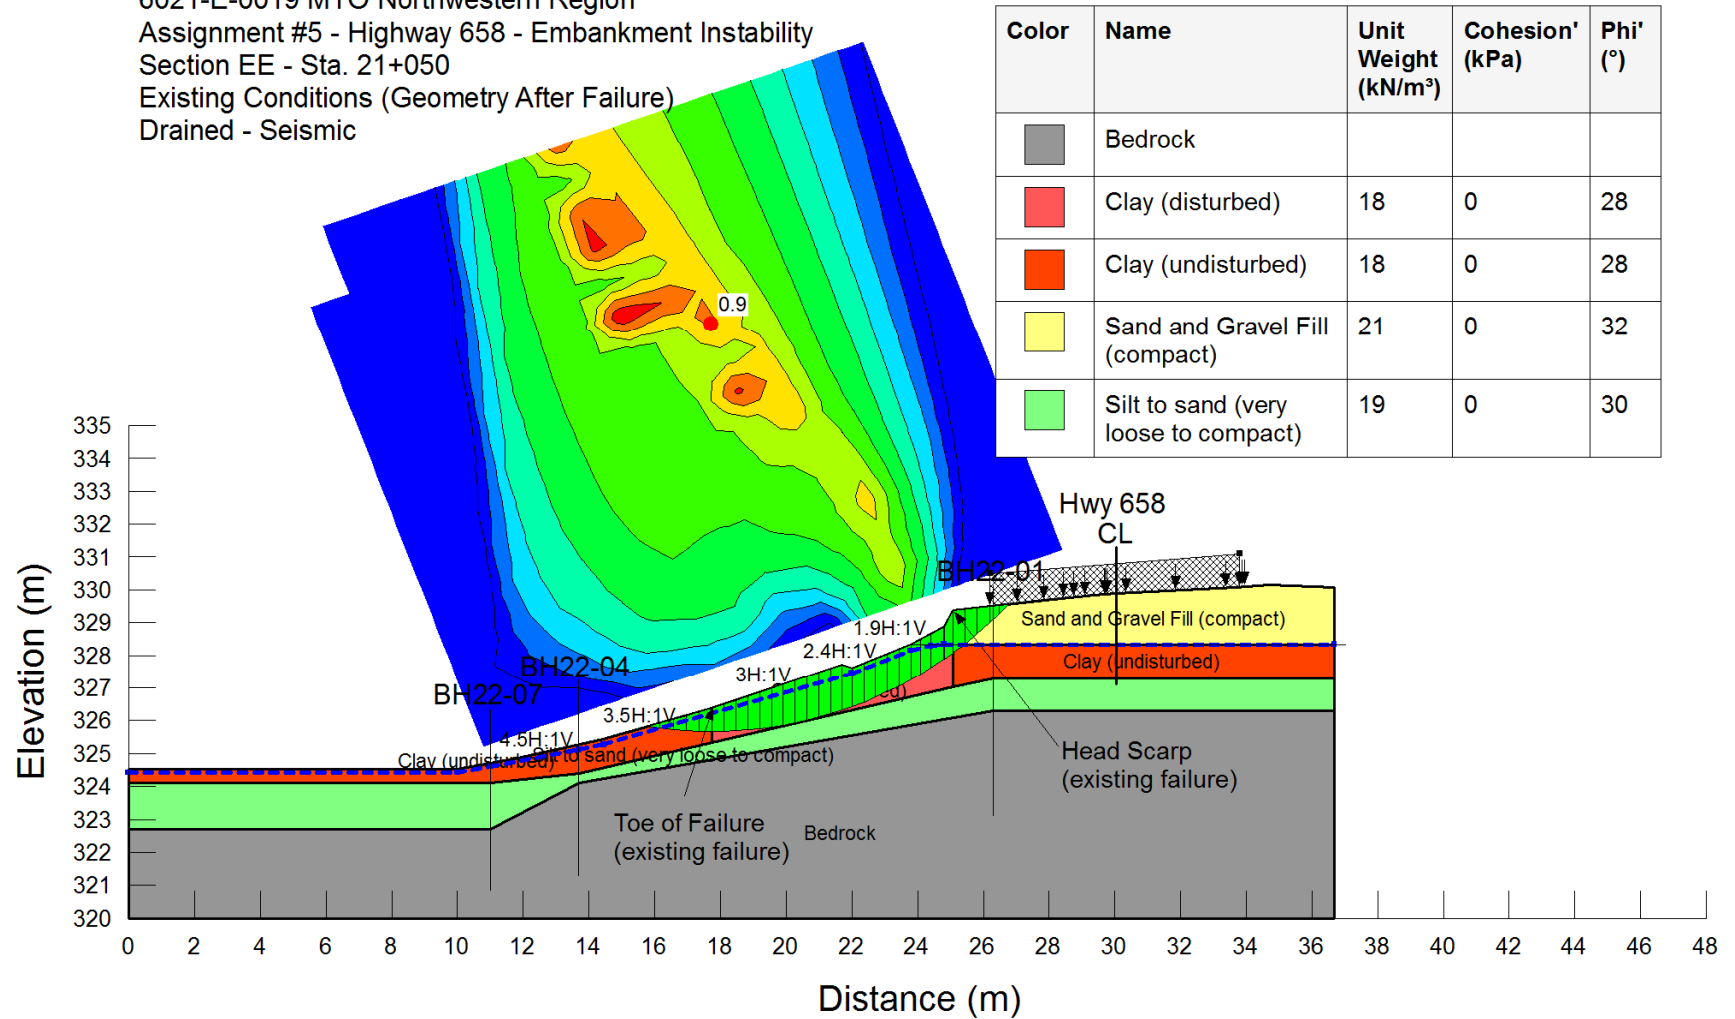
North Section E-E' (Sta. 21+050) – Stability of Slope After 2022 Failure (Current Slope Geometry), High GWL – Drained Seismic Conditions
